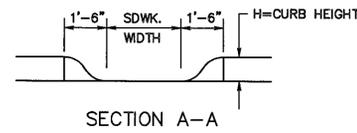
REINFORCED CONCRETE SIDEWALK
